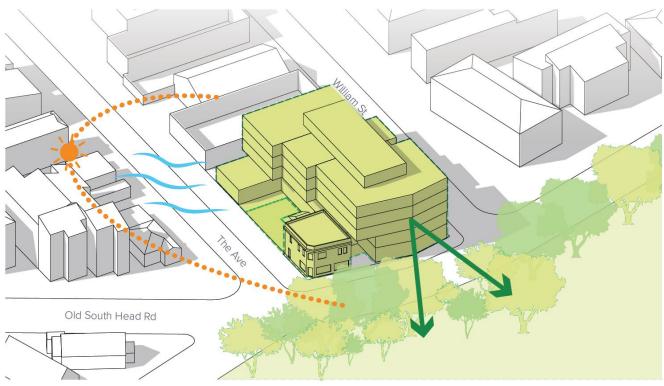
3-D model illustrating the building envelope and massing of the concept scheme (Source: Place Design Justification Report)
